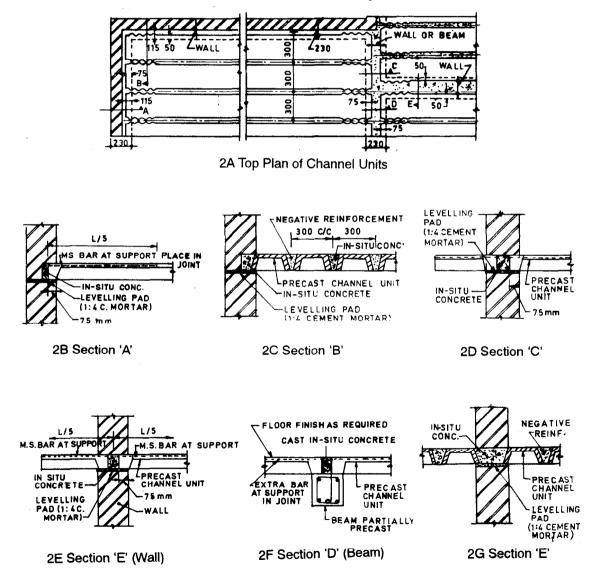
DETAILS OF JOINTS IN A FLOOR WITH CHANNEL UNITS
